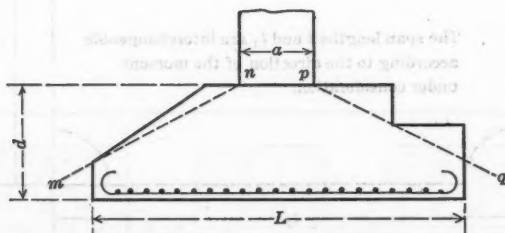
TYPICAL SLOPED OR STEPPED FOOTING.
